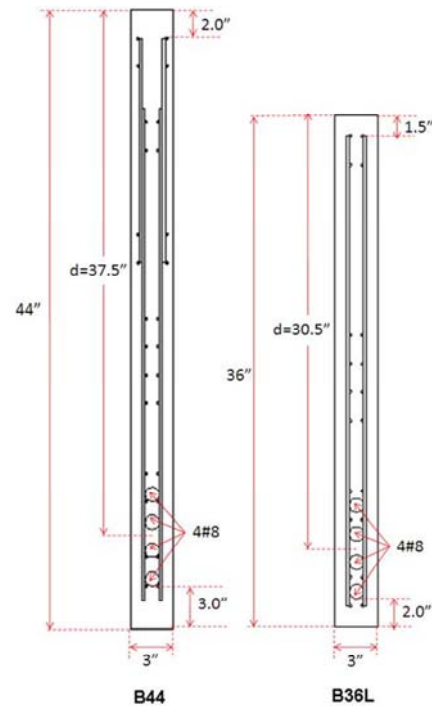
Nominal dimensions and reinforcement details of Phase I test beams
